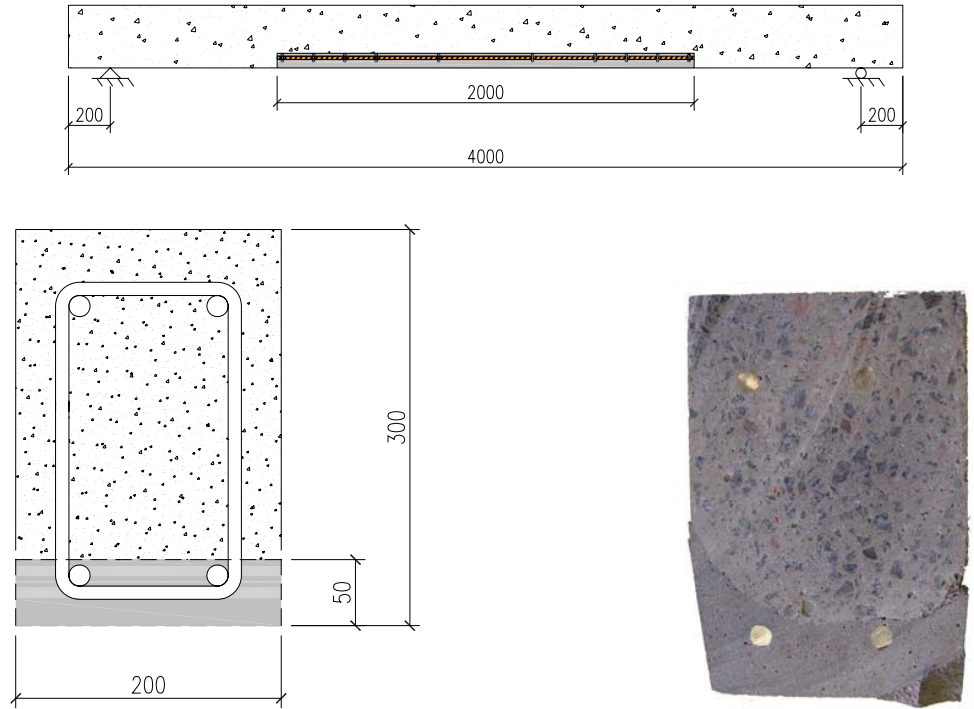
Top: Beam specimen measurements and steel reinforcement layout. Bottom left: Cross sectional view of repaired beam. Bottom right: Cross section of real repaired beam.
